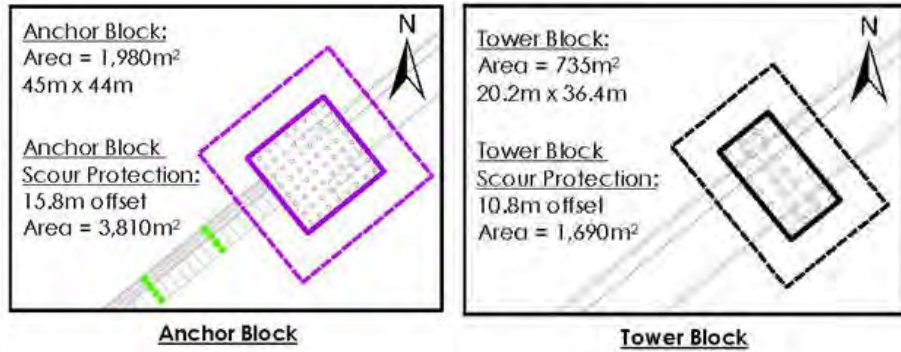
Direct Impacts of SW Anchor Block (left) and SW Tower (right)
